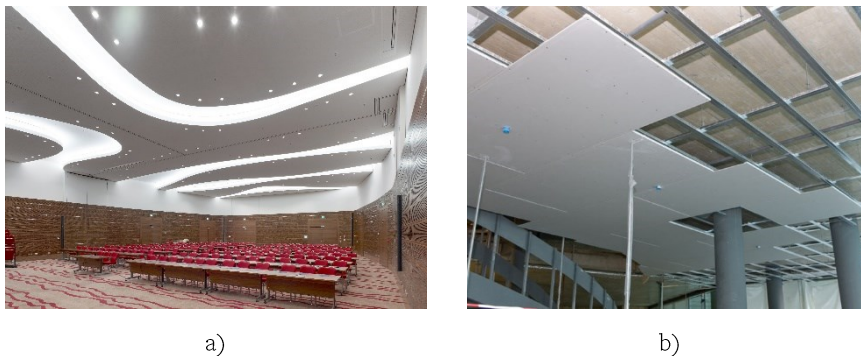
Suspended lightweight steel gypsum board ceilings: a) Hilton Squire, Frankfurt am Main, Germany, JOI-Design GmbH Architect, 2011; b) Palazzo Mantegazza, Lugano, Switzerland, G. Camponovo and associates, 2008
